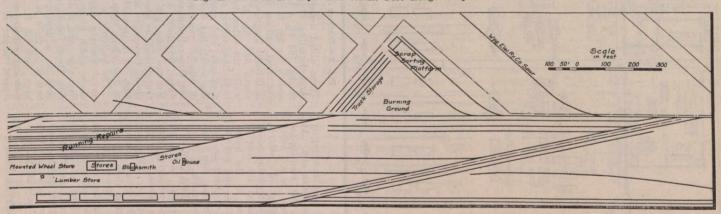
Section 2.-Layout of C.N.R. Fort Rouge Shops-South End.
